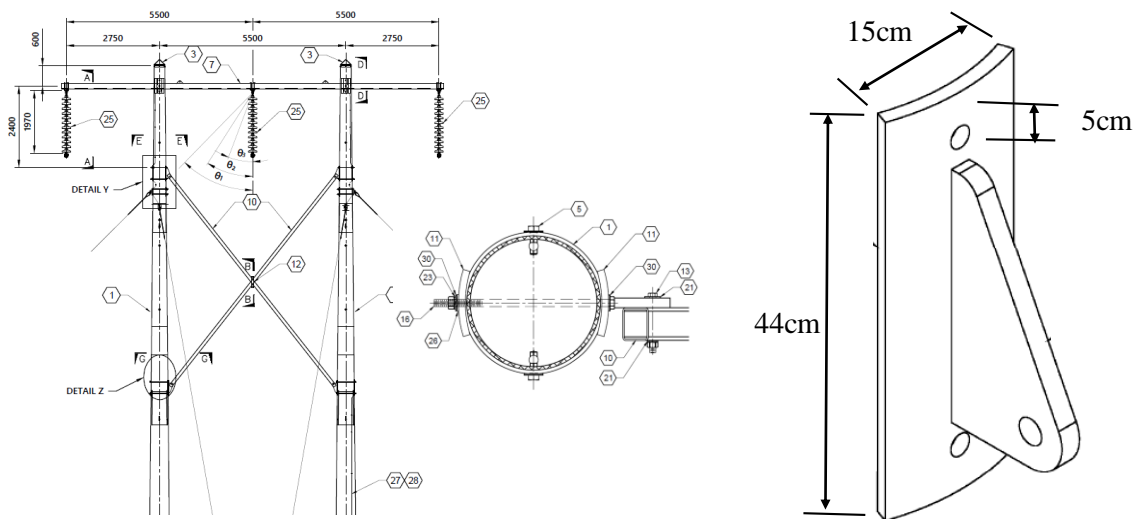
Sketches showing the BCH new 230kV FRP H-frame design (left) and the associated new cross brace bracket design (right).
